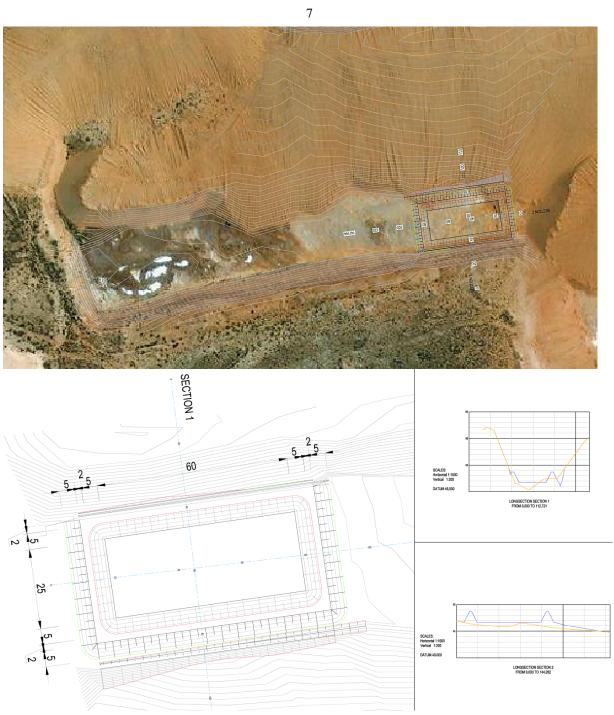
Engineering drawings of the proposed disposal site design for the preferred site
